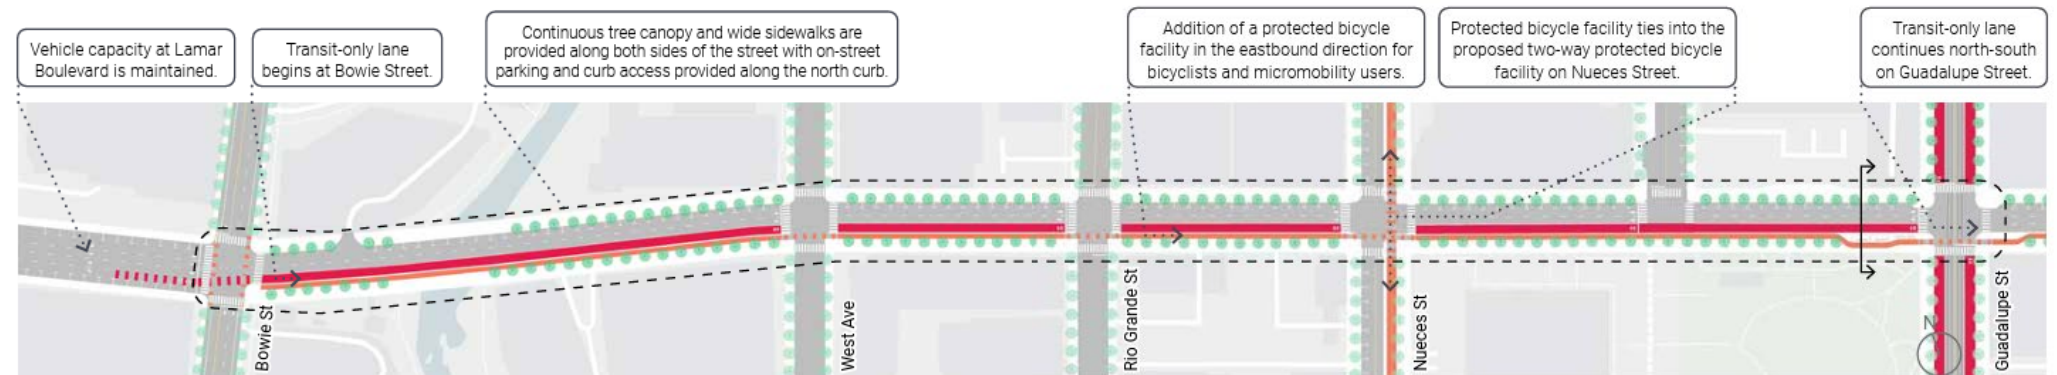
Fifth Street schematic Bowie Street to Guadalupe Street
